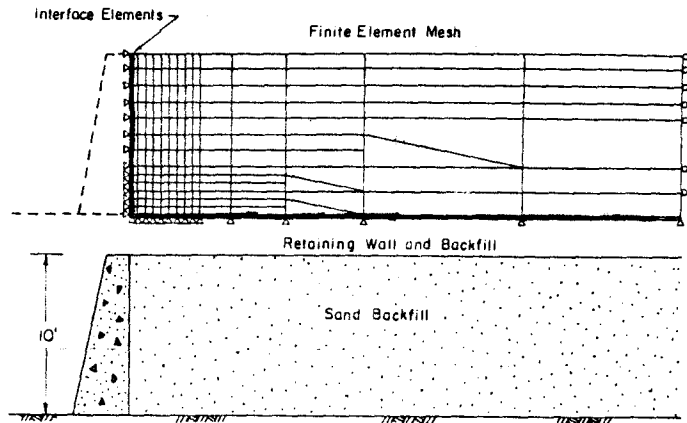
RETAINING WALL—BACKFILL SYSTEM AND FINITE ELEMENT REPRESENTATION
